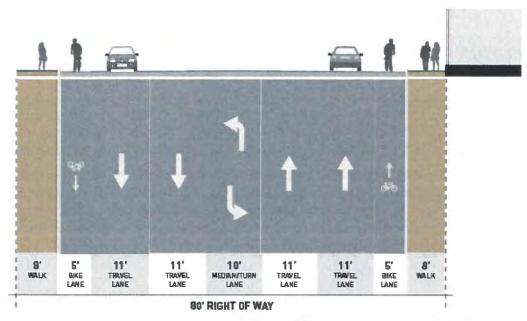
Existing Condition B: Maple to Brown Street on West Broad Street in the Western Gateway Sub-District
